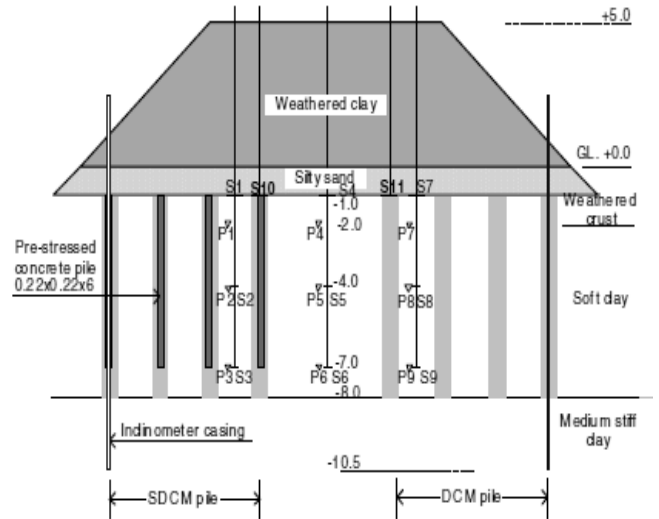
Section of instrumented test embankment supported by SDCM and DCM piles (after Bergado *et al.* 2009)
